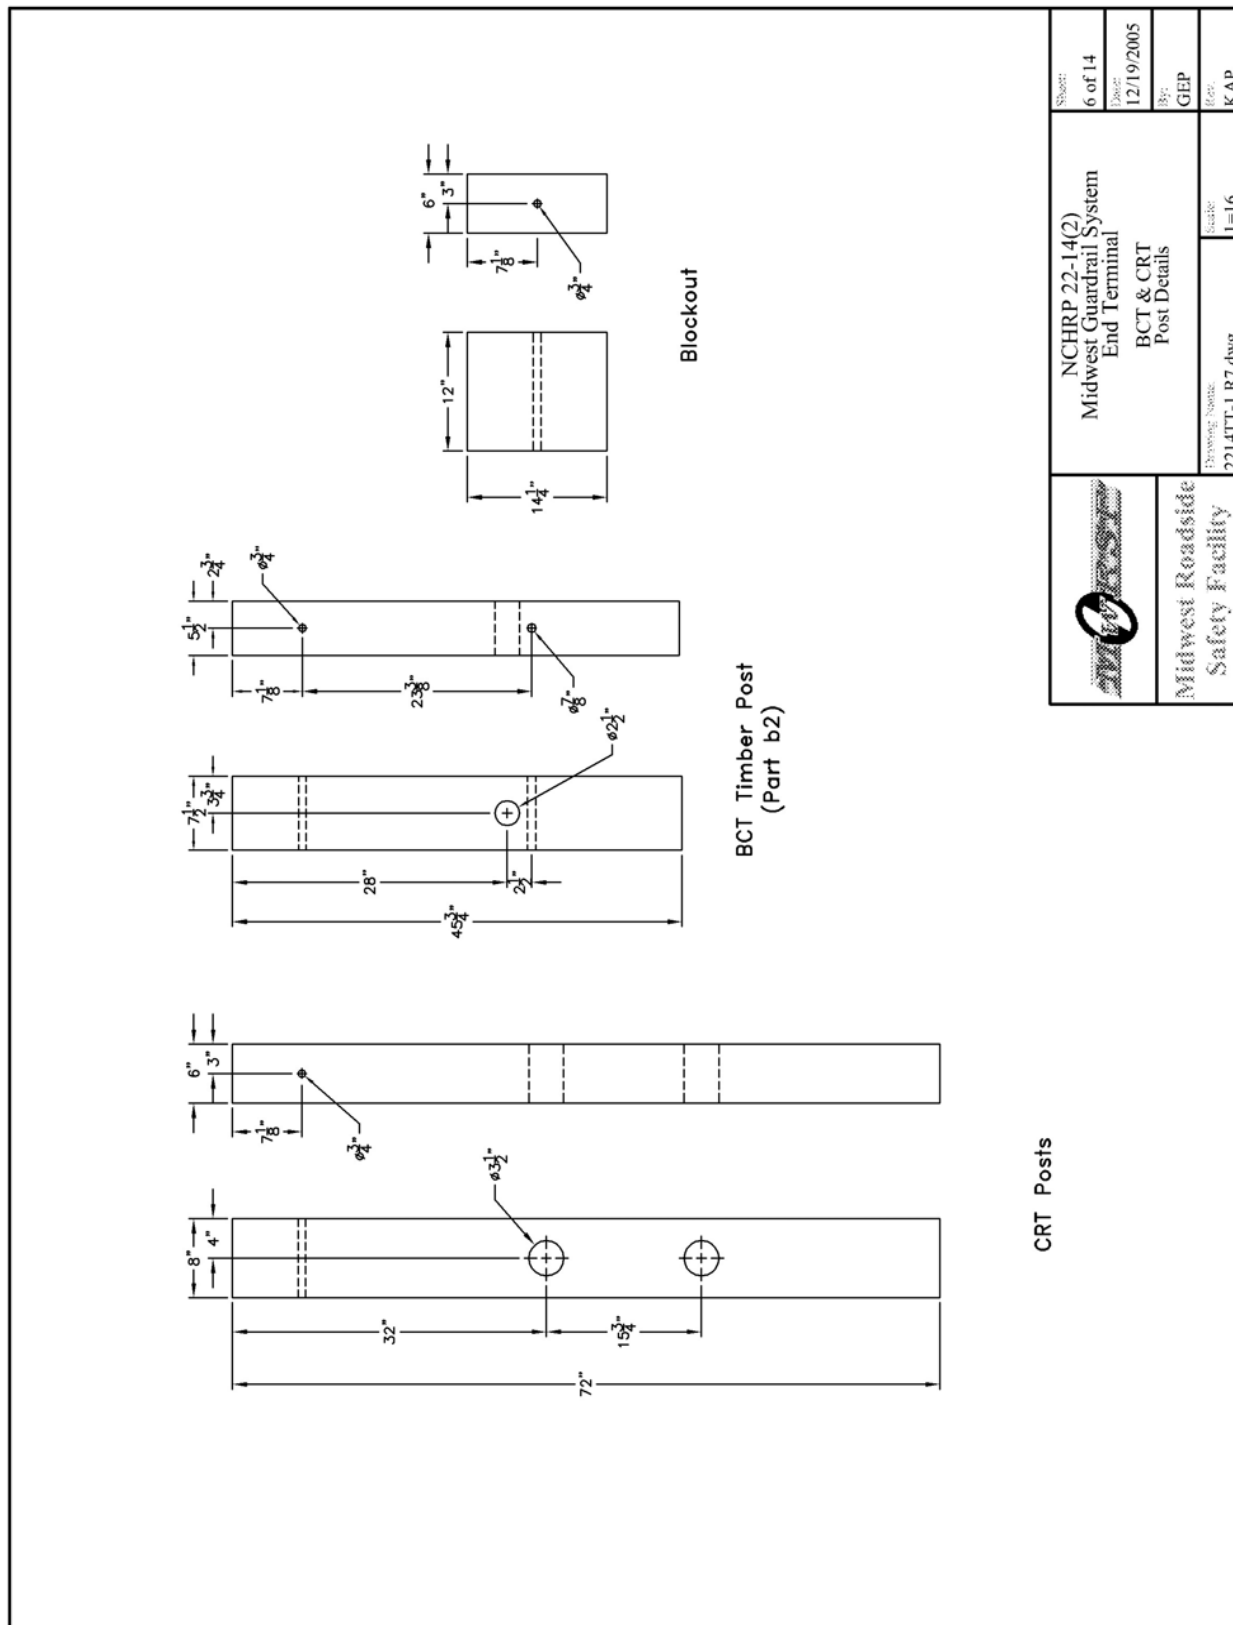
Midwest Guardrail System End Terminal - Post Details (English)
